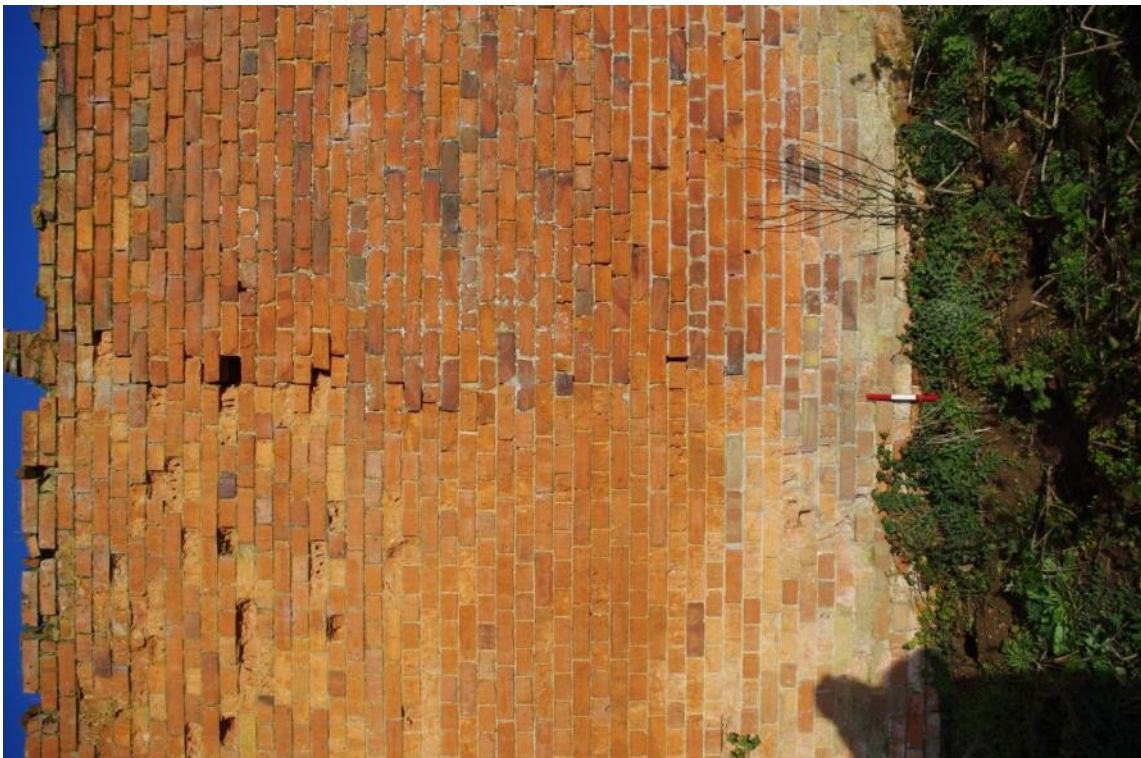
Straight Joint Between D & E Visible on South Facing Elevation.
